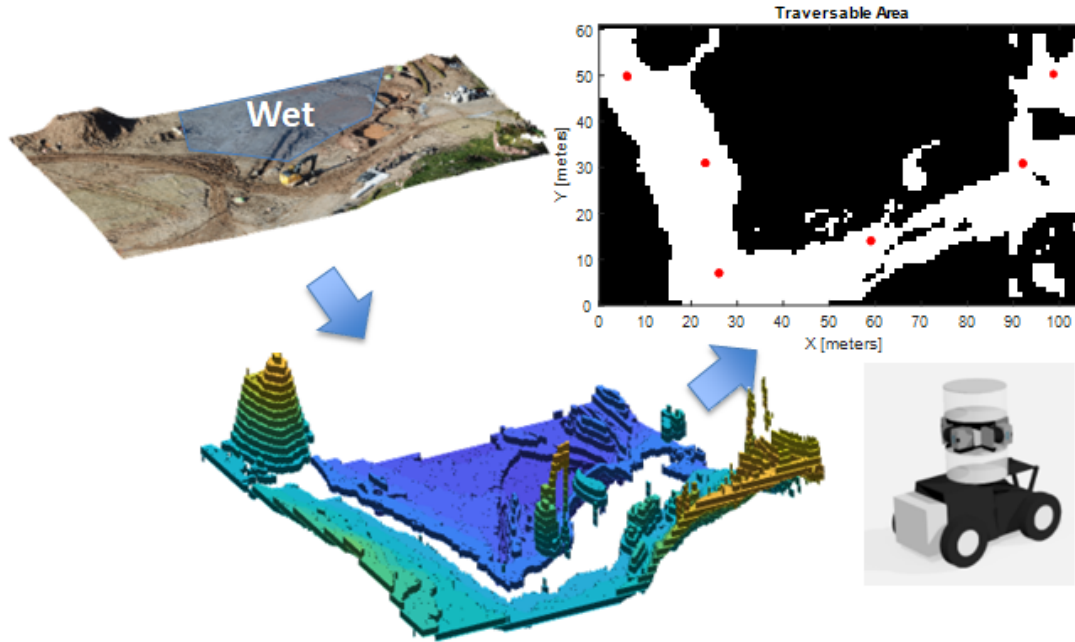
Field test construction site surrounded by obstacles and hills
